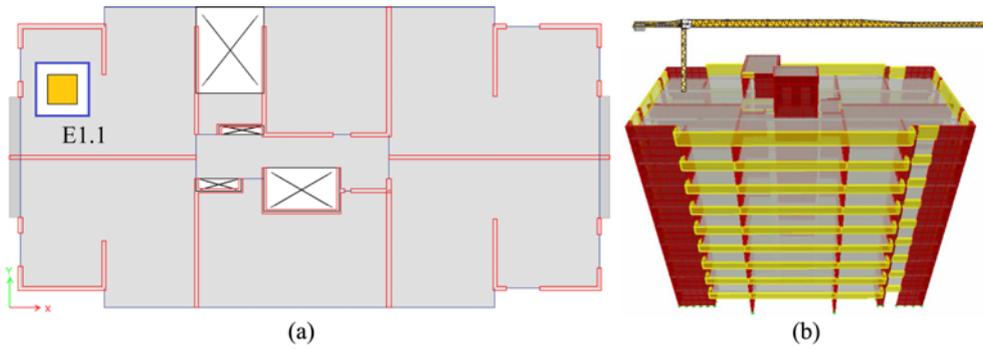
Location of Tower Crane for Type A Building (with opening): (a) Plan View, (b) 3D View
